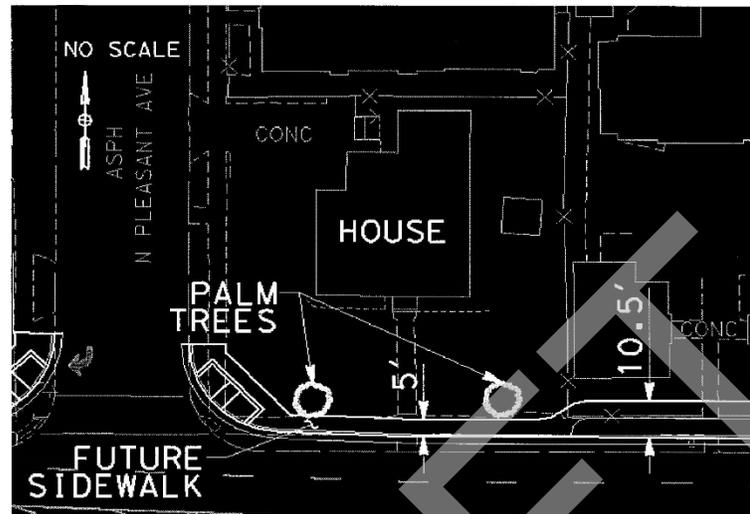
The City of Ontario reviewed but did not accept plans which would have removed a proposed parkway, which would have left the two historic date palms in their current location.
